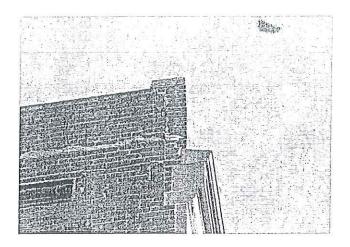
Prior repairs and displacement of parapet at the southeast corner of Nelson House Annex.
